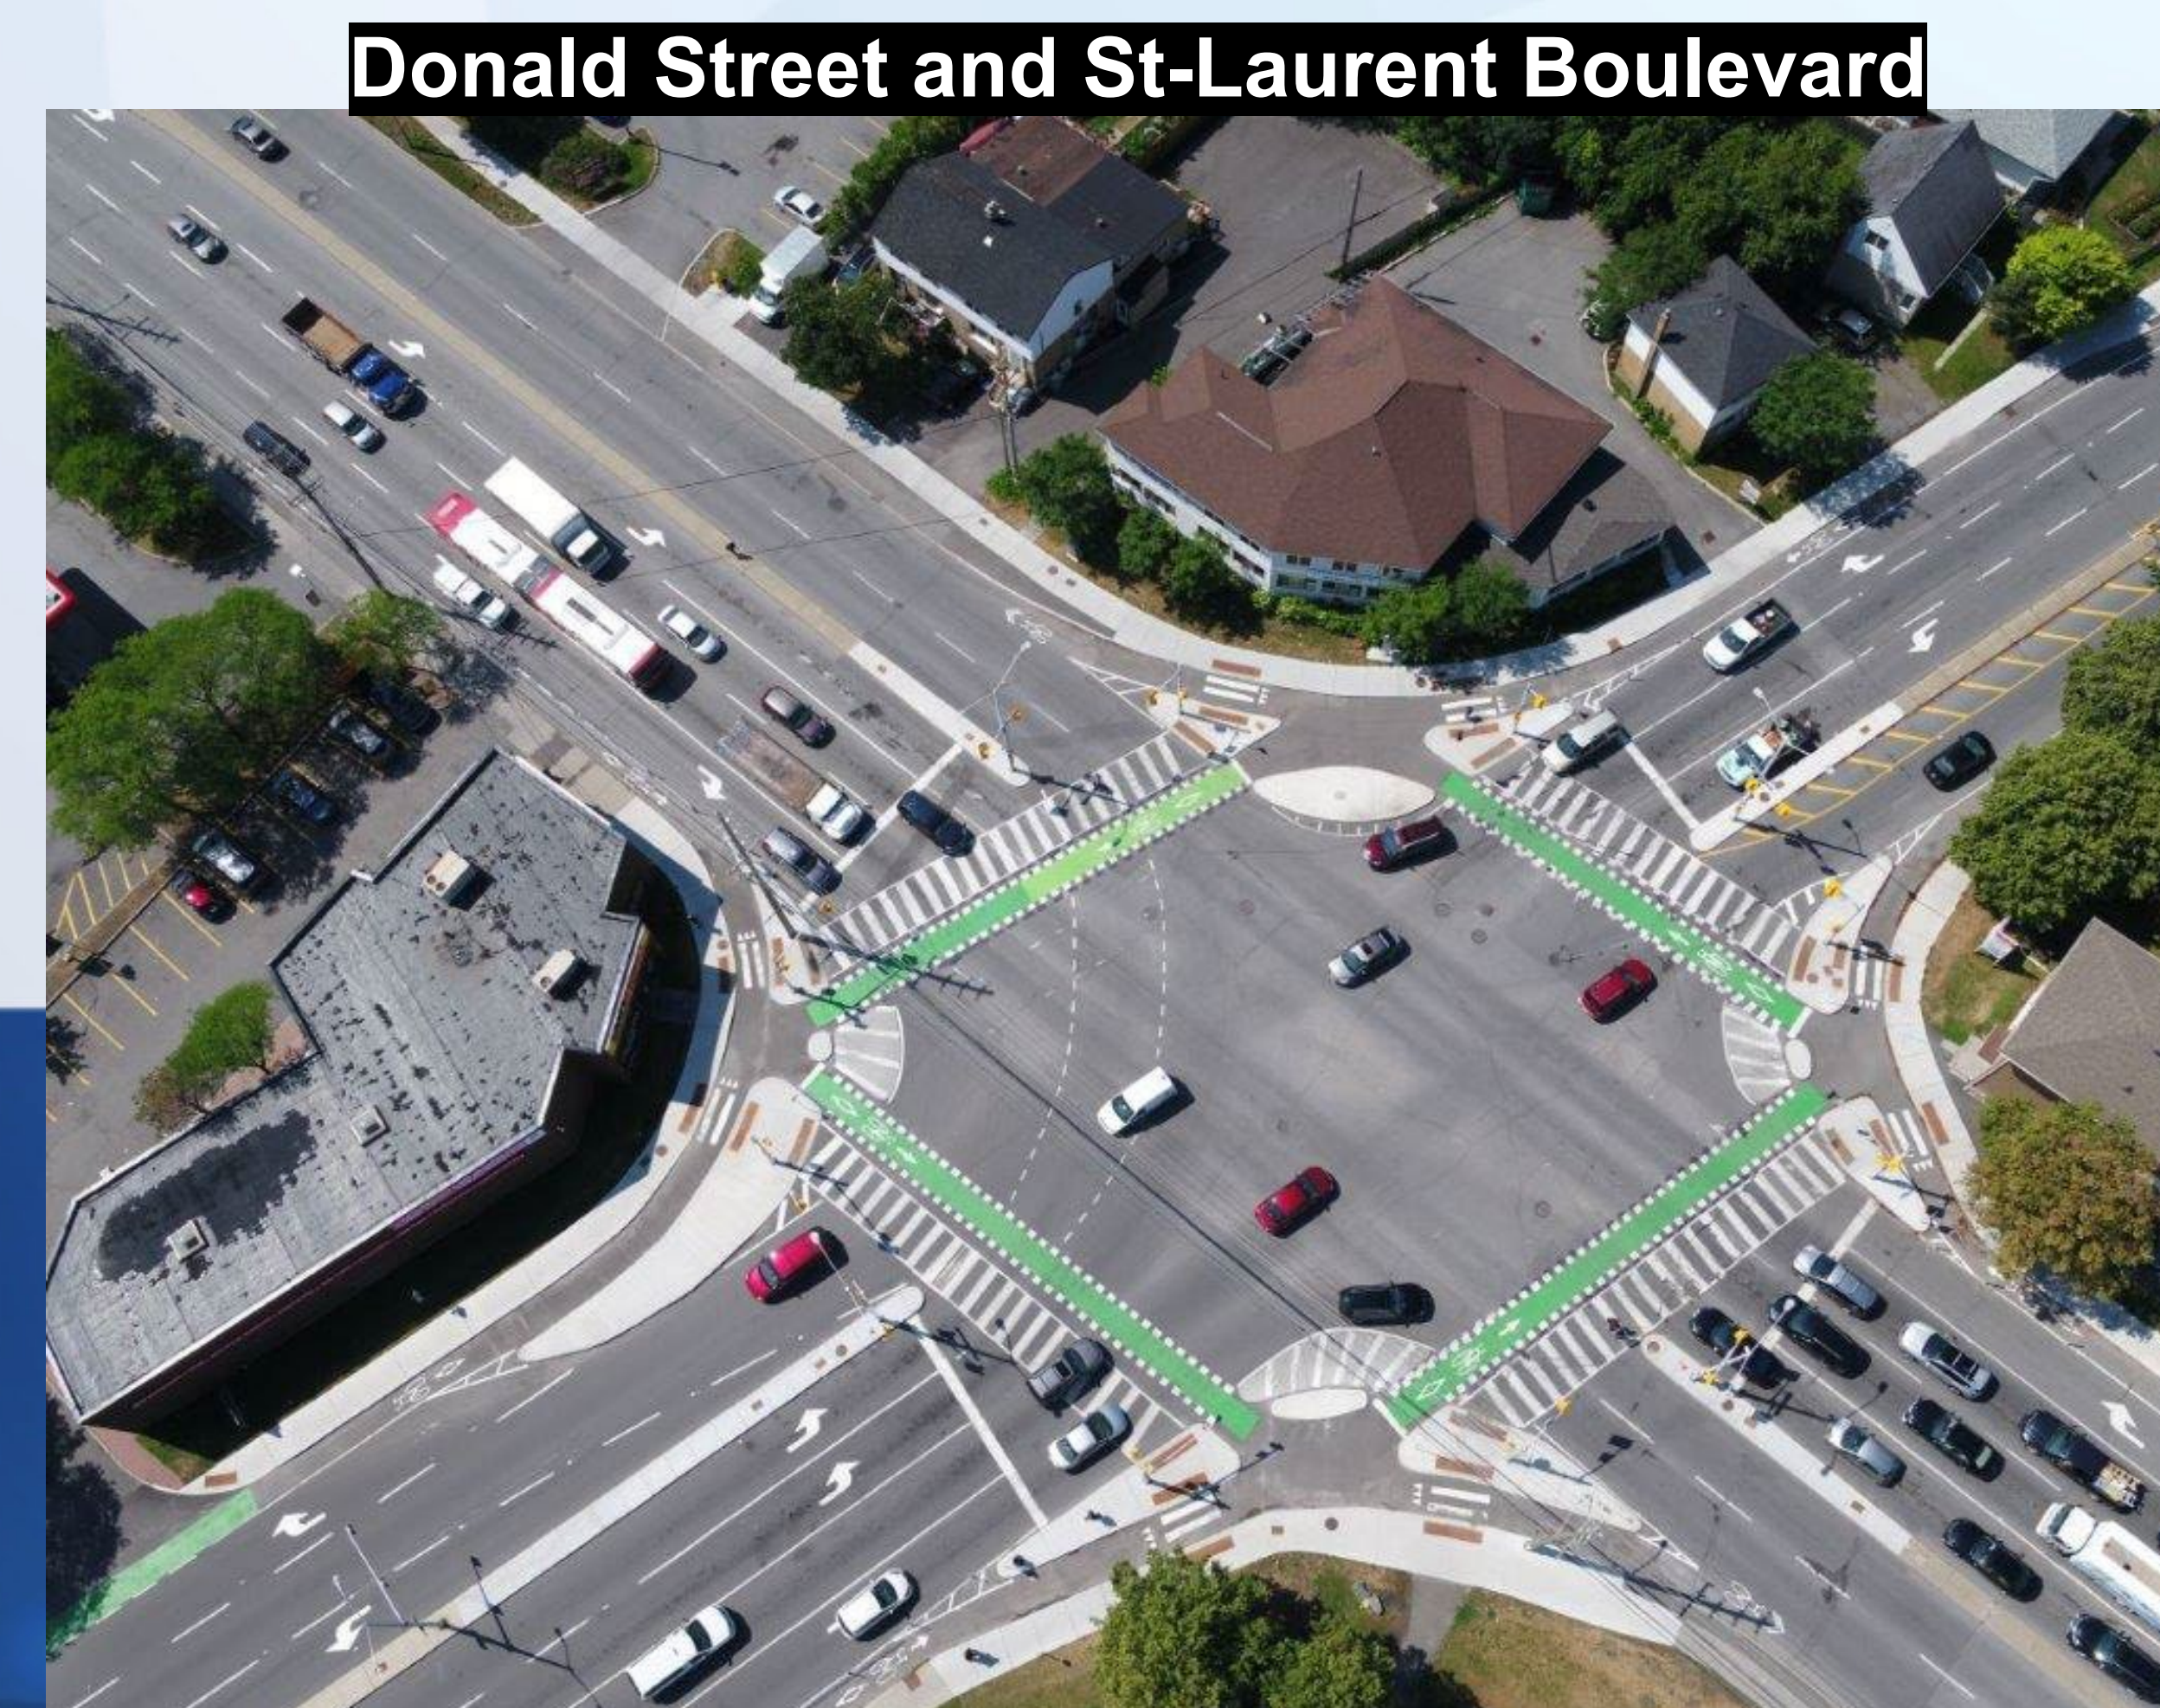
Example of corner diagonal at Donald Street and St-Laurent Boulevard
